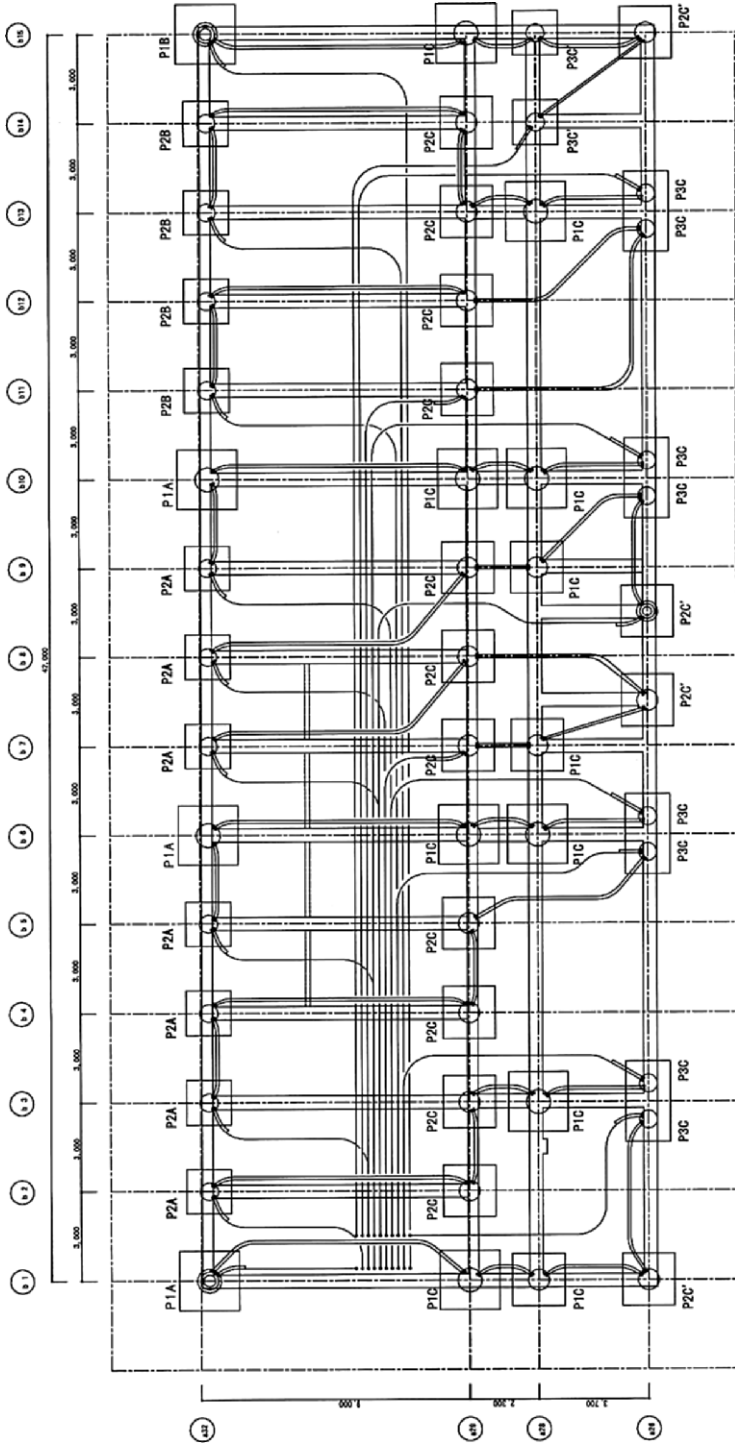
Layout of installed steel foundation piles and piping (51 piles with 600 ~ 800 mm φ in diameter)
